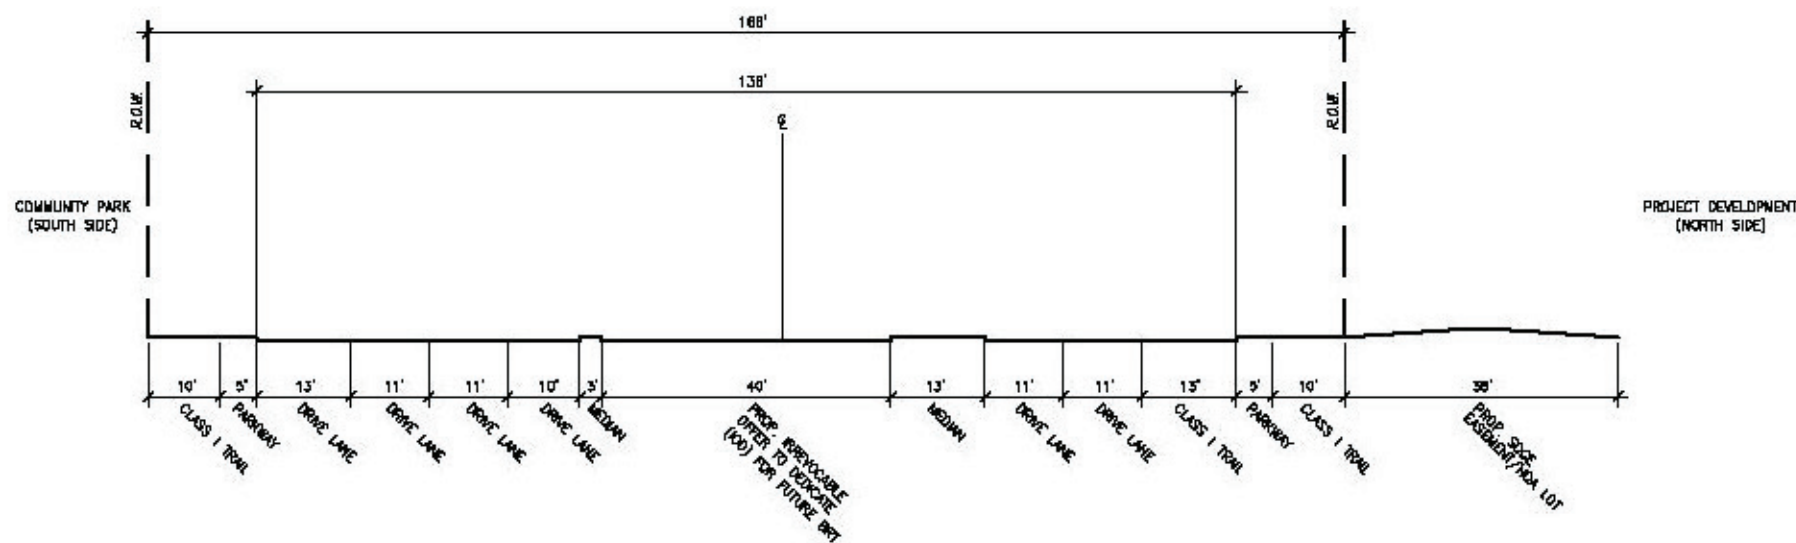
STANDARD CROSS SECTION OF CARROLL CANYON ROAD (SECTION A-A)
